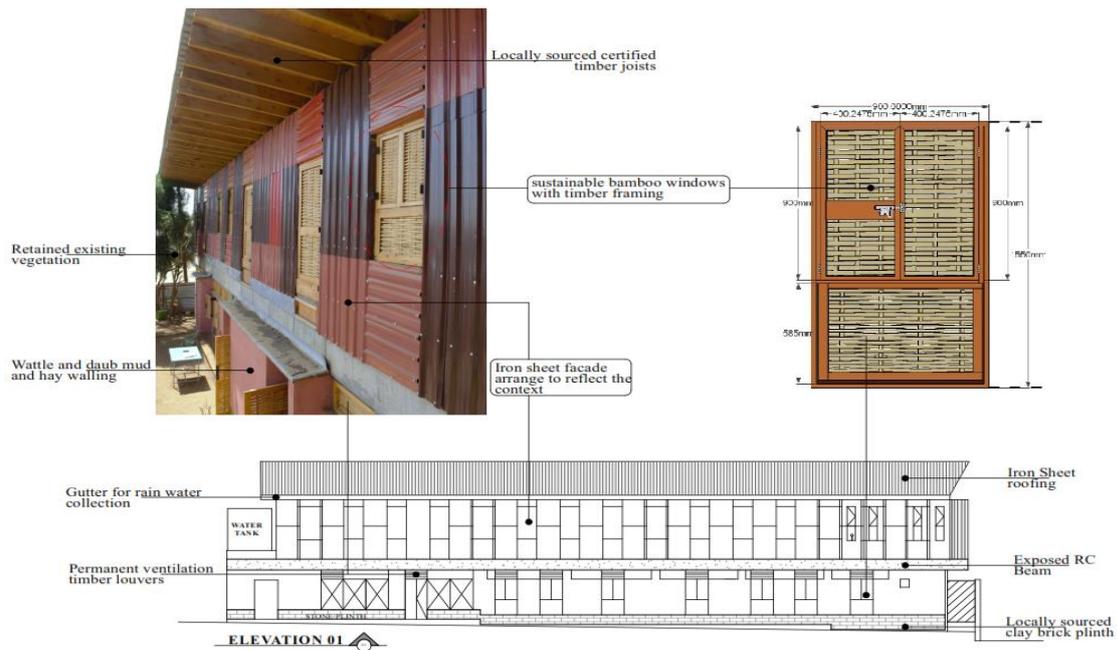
Anwa School Elevation detail. Source: Author, 2017. Modified from KDI drawings
